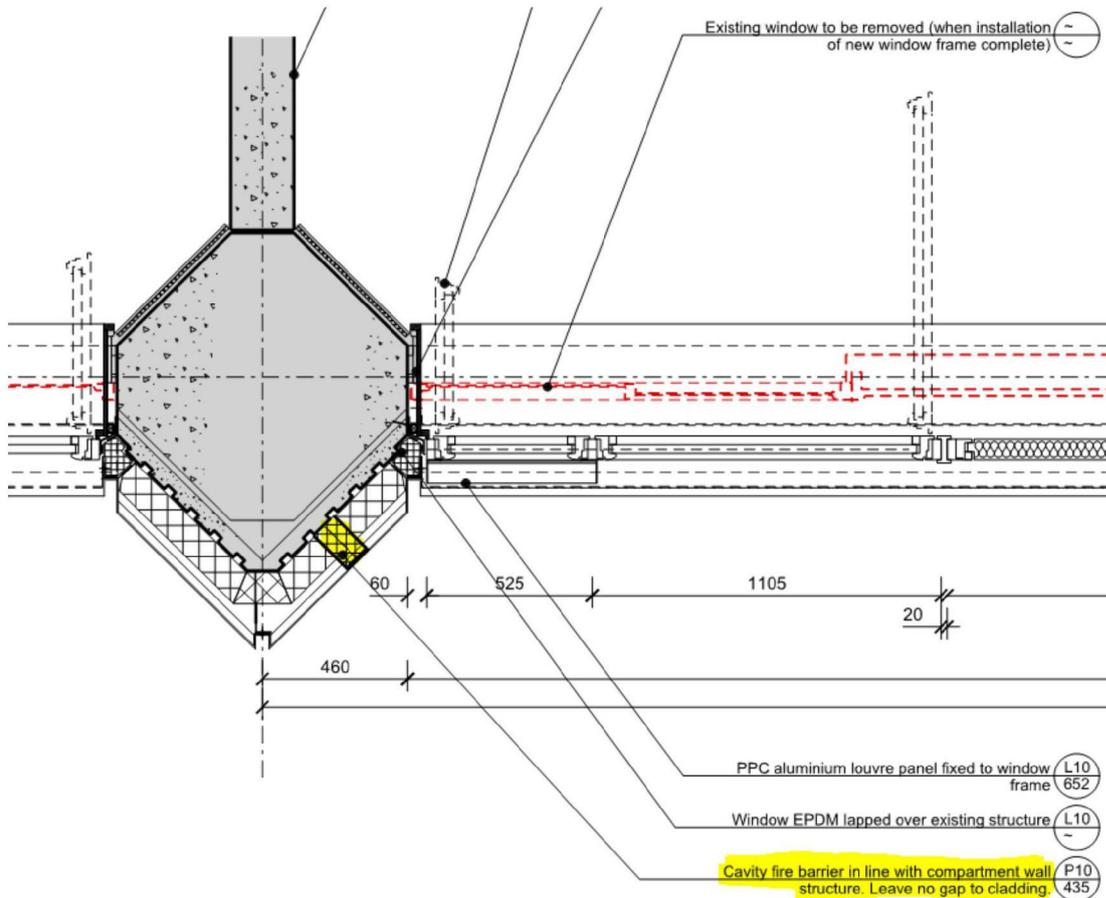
Extract from Studio E Employer's Requirements drawing 1279 (06) 110 00 'Proposed Typical Bay Plans, Section & Elevation' {SEA00002499}
